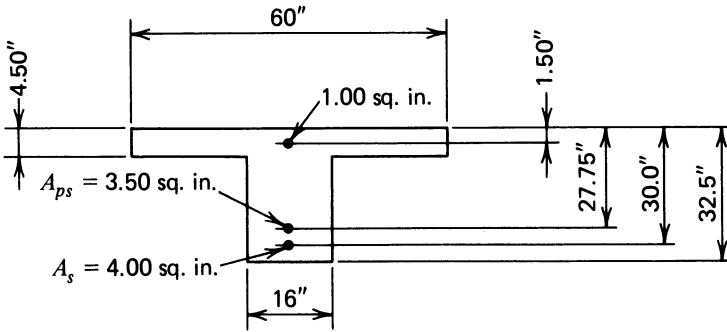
Cross section of T-beam having compression reinforcement.
